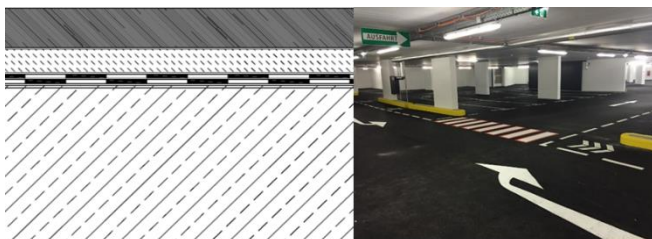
Pavement structures not exposed to weathering with asphalt concrete wearing course with 3 cm AC 8 deck on a 2 cm protection layer on a 2-layer bituminous waterproofing layer
